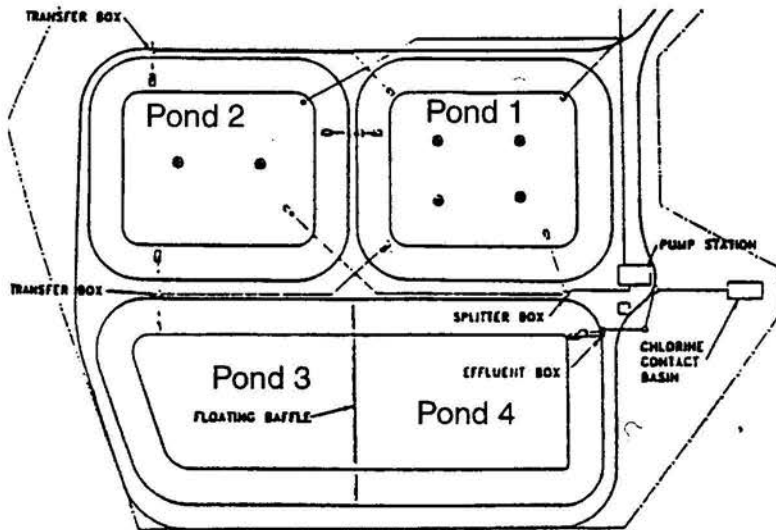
Site Layout of Boxelder Sanitation District Ponds
